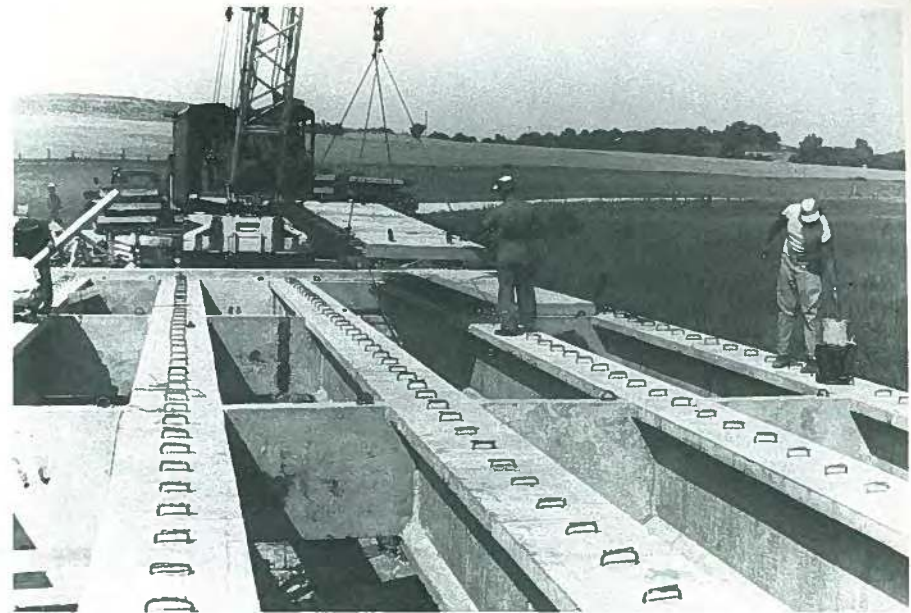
Ezell Pike Bridge, 80-ft (24.4 m) girders with deflected strands and precast deck slabs. Built in 1954.
